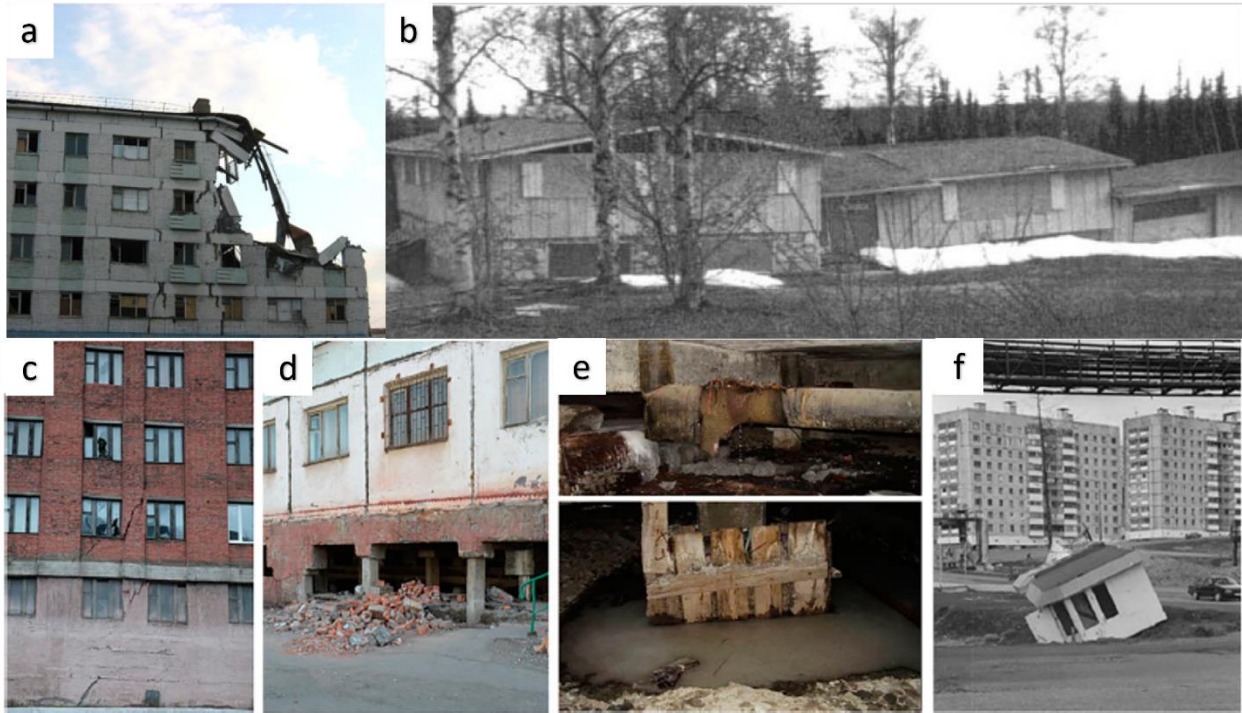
Observed deterioration of structures. (a) collapsed 5-storey building in Norilsk due to loss of pile bearing capacity. (b) House settlement in Fairbanks. (c) Cracks and deteriorations of building due to permafrost warming. (d) Weathering of foundation caused by intense freeze-thaw cycles. (e) Leakage under the building. (f) Ground subsidence under a kiosk in Norilsk (Edwin and Clarke, 2007; Shiklomanov et al., 2017).
